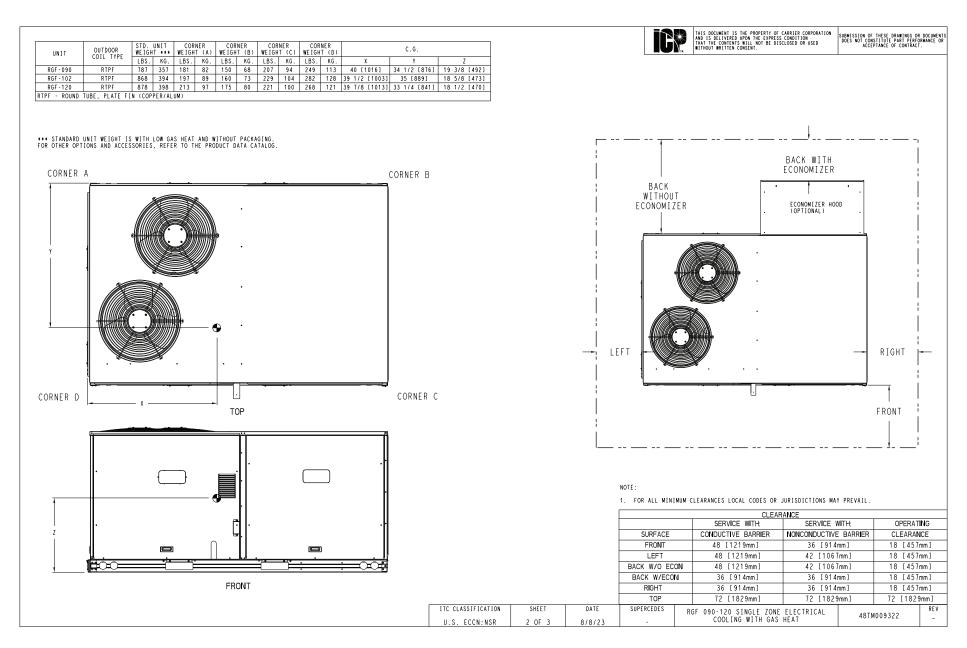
Unit Dimensional Drawing - Sizes 090, 102, 120 (cont)
